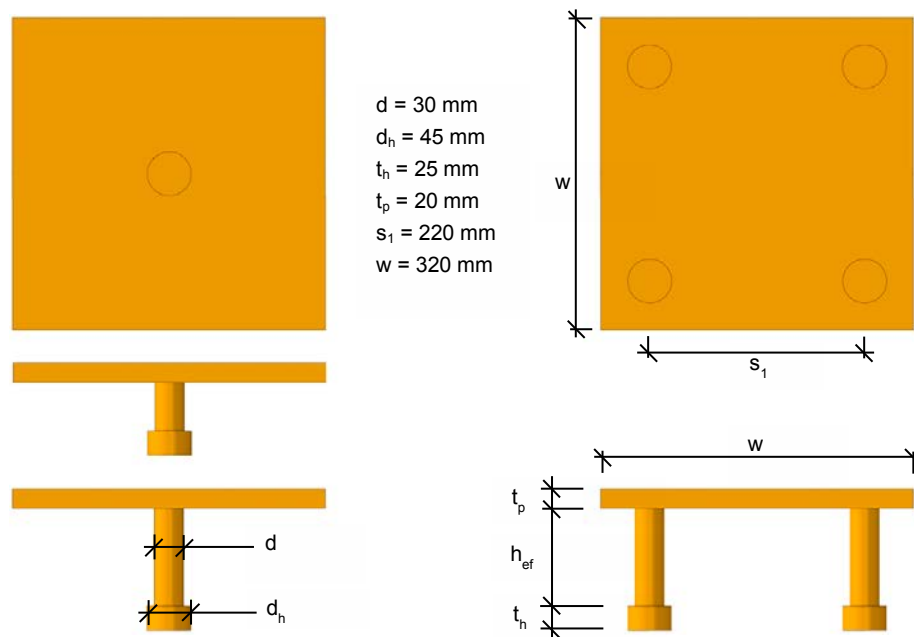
Dimensions of anchors and non-embedded steel plate that are studied.
